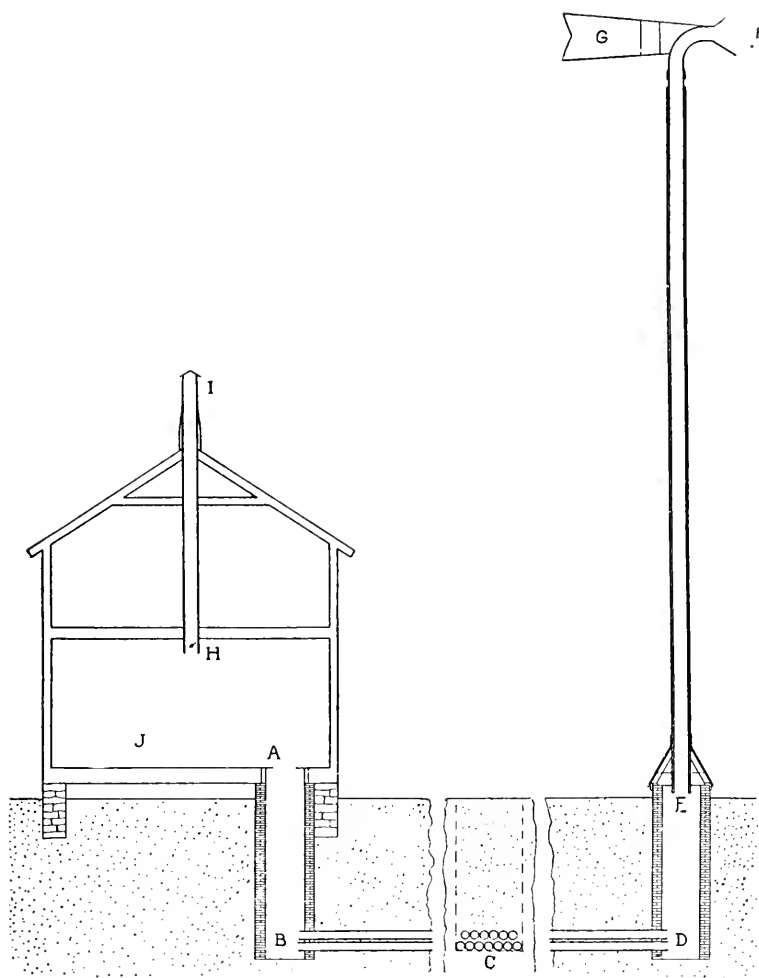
Plate VIII.—Section of cheese-curing room and horizontal multiple sub-earth duct. A, inlet to curing room; B, end of sub-earth duct in bricked entrance to factory; C, cross-section of the multiple ducts; D, E, bricked entrance under funnel at outer end of sub-earth duct; F, funnel with mouth 36 inches across; G, vane to hold funnel to the wind; H, ventilating flue with damper. (From Wis. Agr. Exp. Sta. Bul. 70.)
